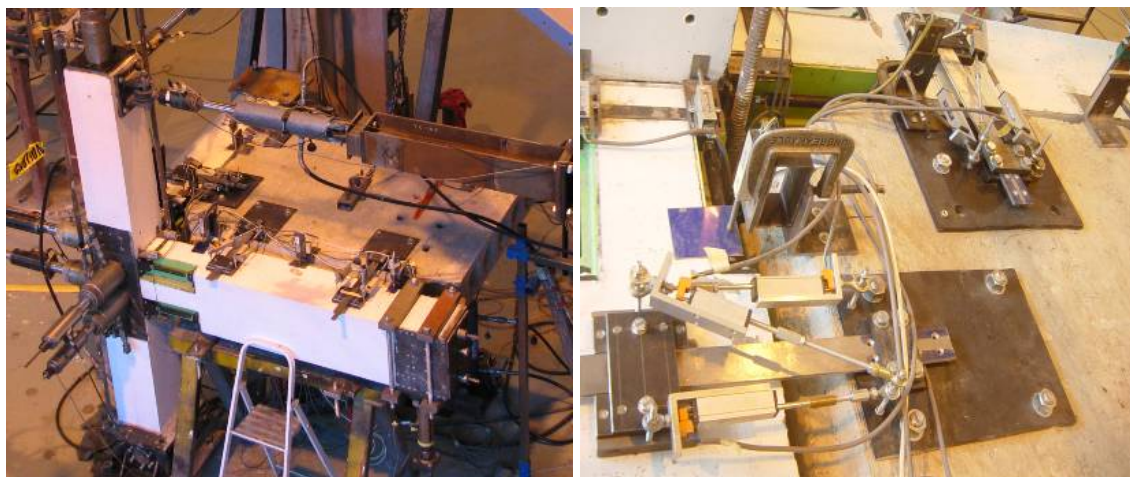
Beam-column joint with articulated floor unit: Top view (left) and connection details (right).
